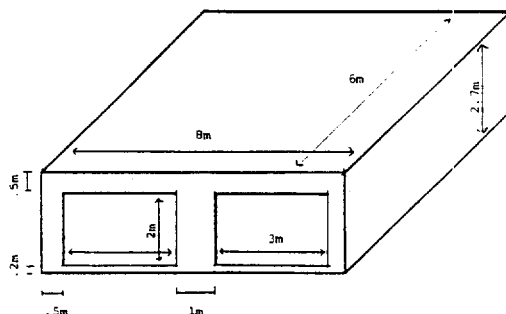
IEA BESTEST Base Building with Unshaded South Facing Windows
